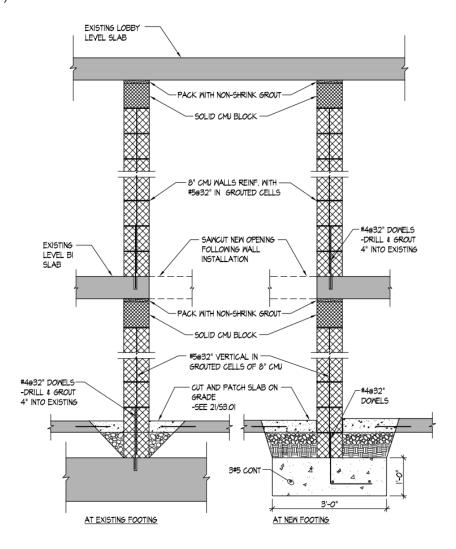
Section through new load bearing CMU walls. 1/S3.02
